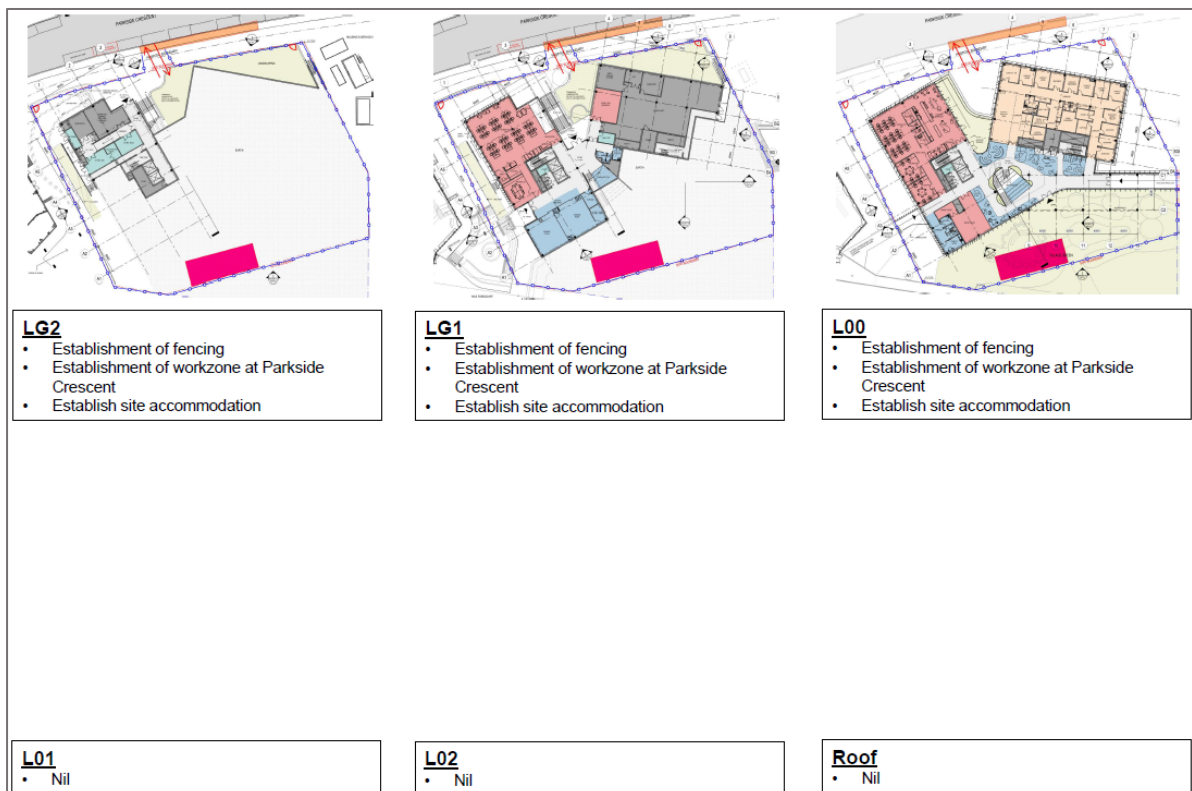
Stage 1: Site establishment. Source: CPM Consulting
